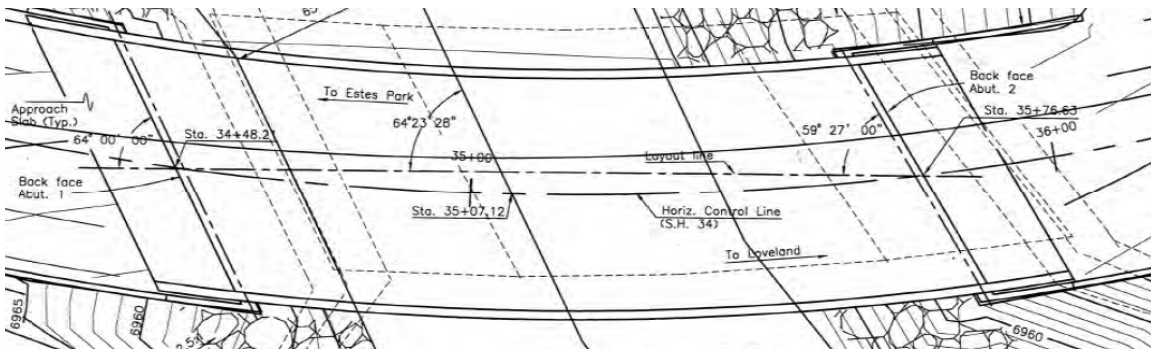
Plan view of the bridge deck of C-15-U (CDOT see Appendix A)
